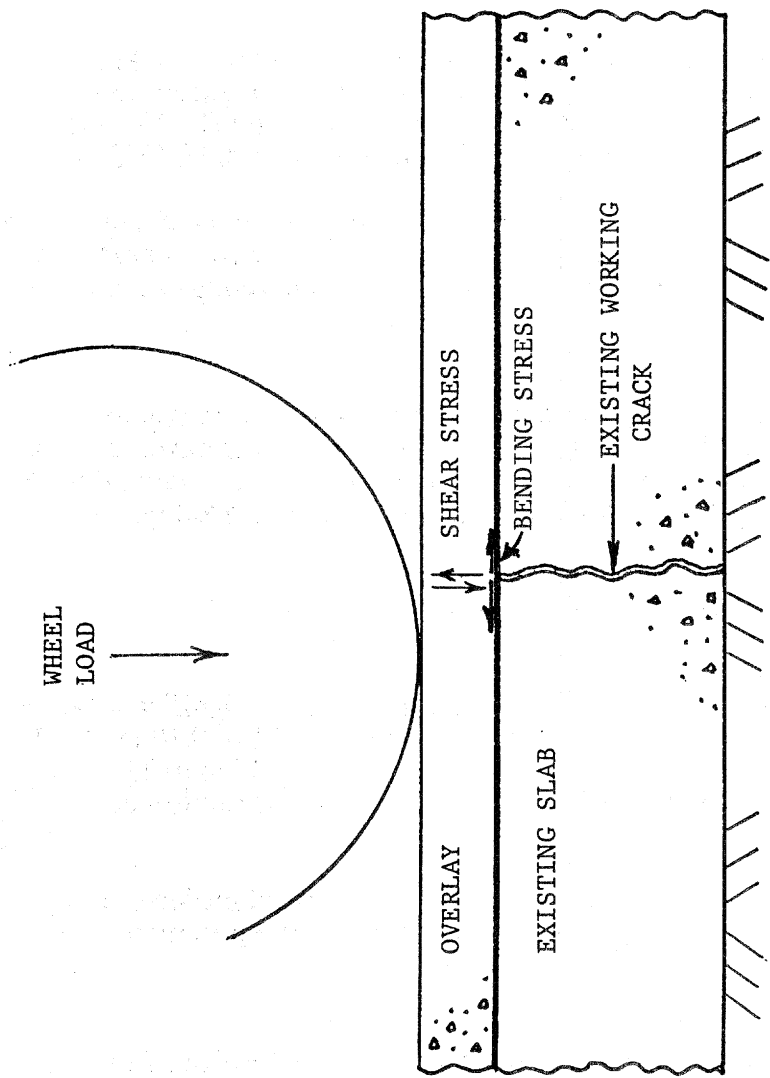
Development and deterioration of reflective transverse cracking in bonded concrete overlays from shearing stresses and bending stresses created by traffic loadings.
